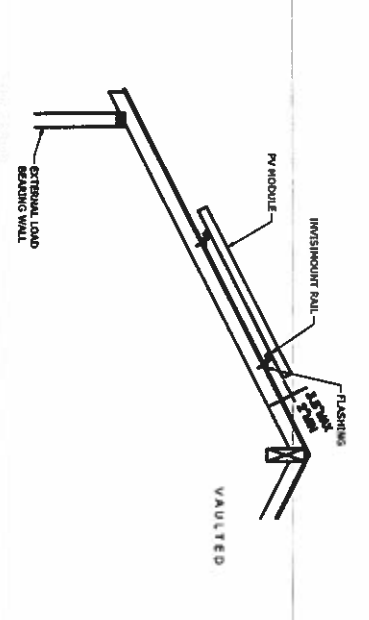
ROOF 2B STRUCTURAL FRAMING DETAIL
